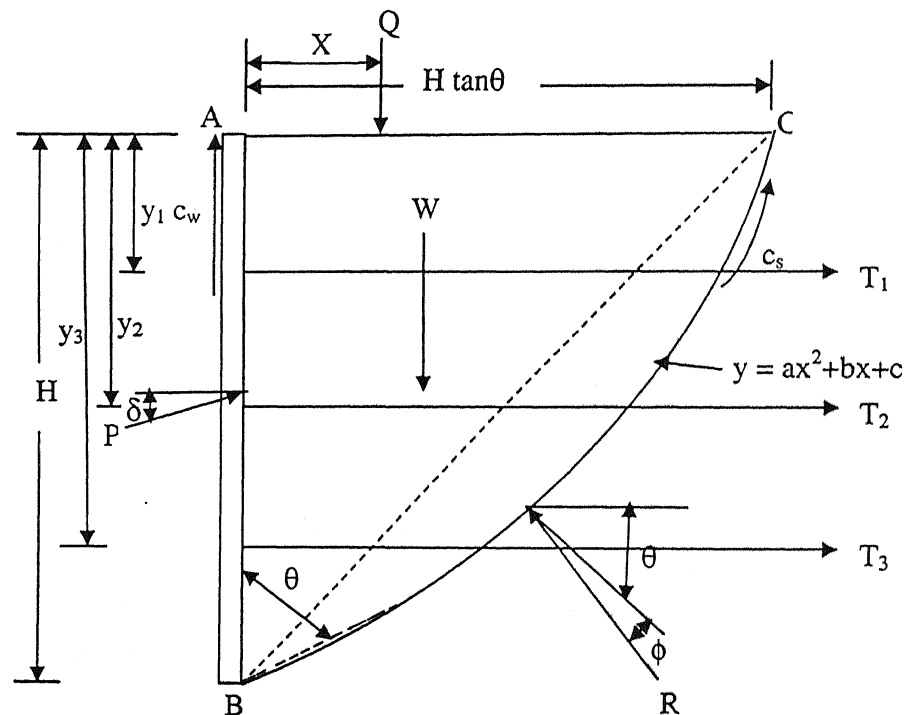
Forces acting on cantilever retaining wall (line load, reinforced backfill)
